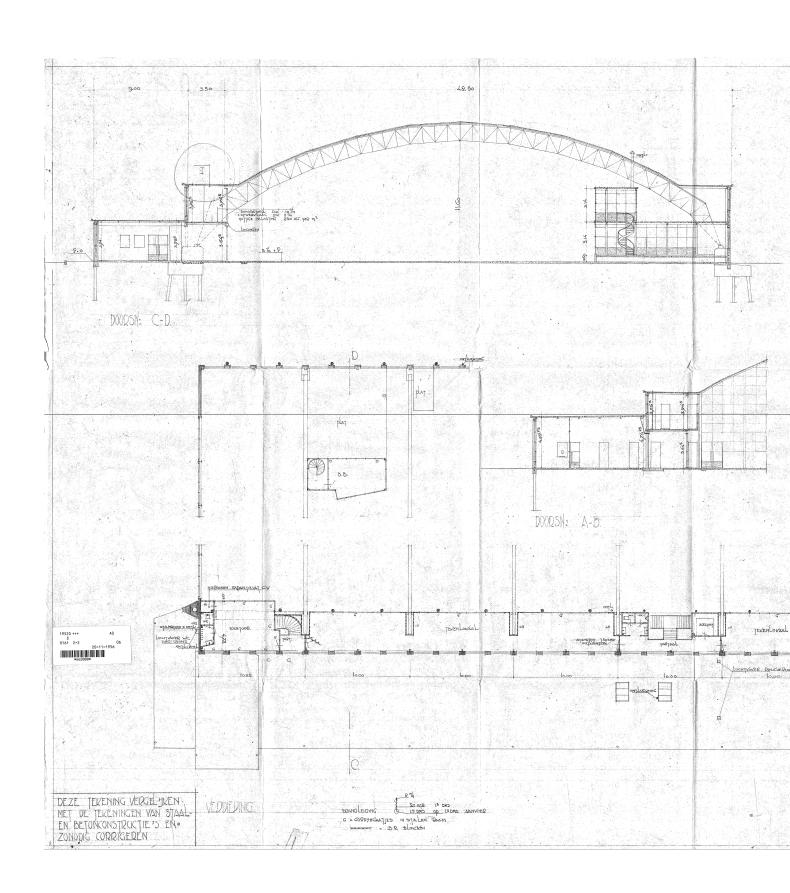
Escher Hall plan scan from Construction Drawings Archive of The Hague
